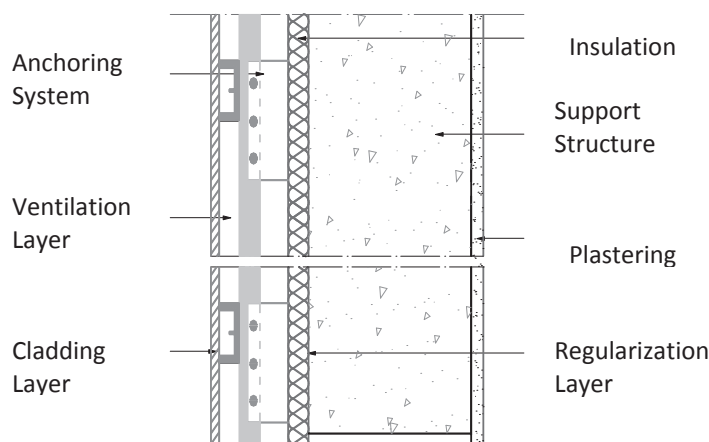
Transversal section of a typical ventilated façade (Mateus, 2004)
